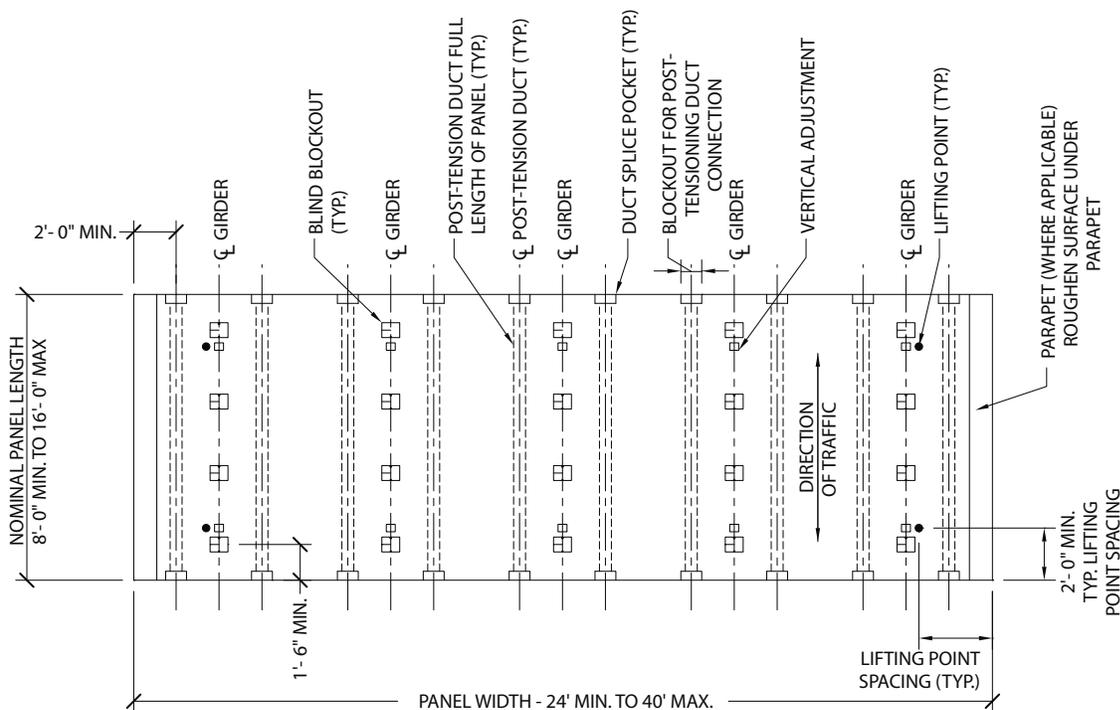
Plan view- Utah Standard full depth deck panel
